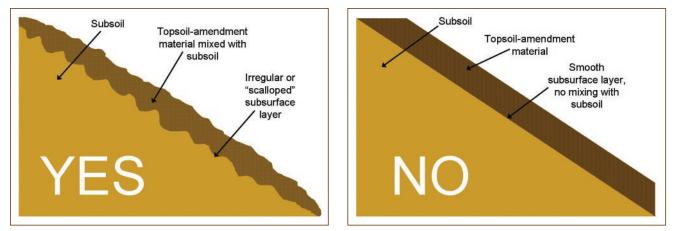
Topsoil amendment applied and mixed with subsoil, creating a "scalloped" subsurface layer (left). Typical topsoil-amendment application without mixing with subsoil (right).
